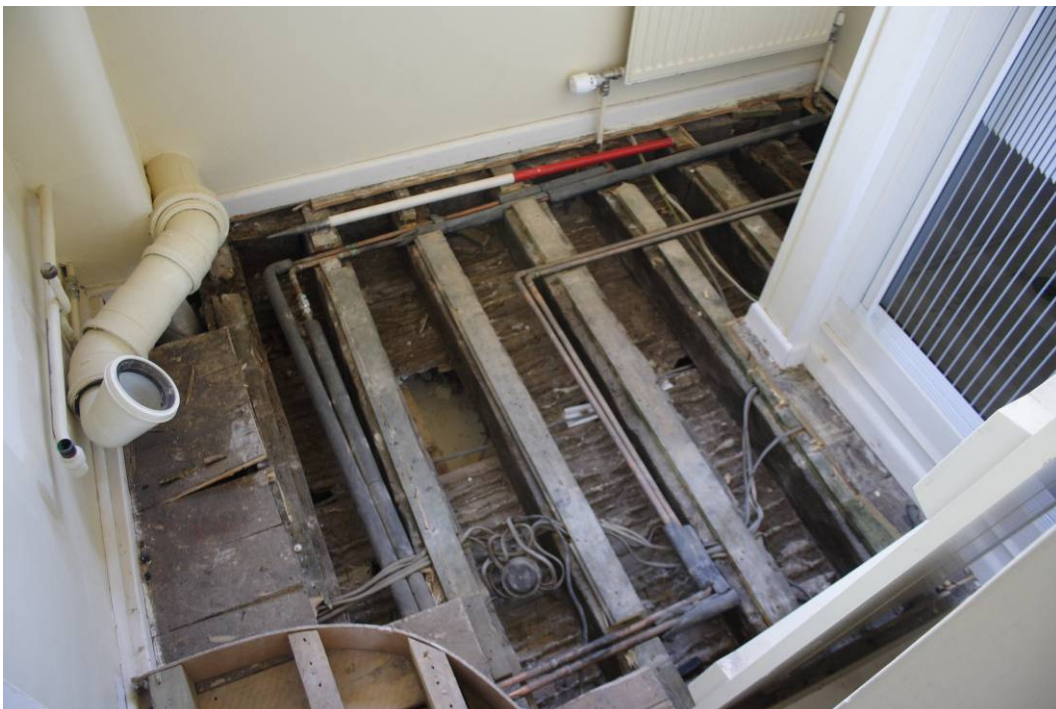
Bathroom 204 following removal of floorboards showing underlying joists and lath and plaster ceiling
